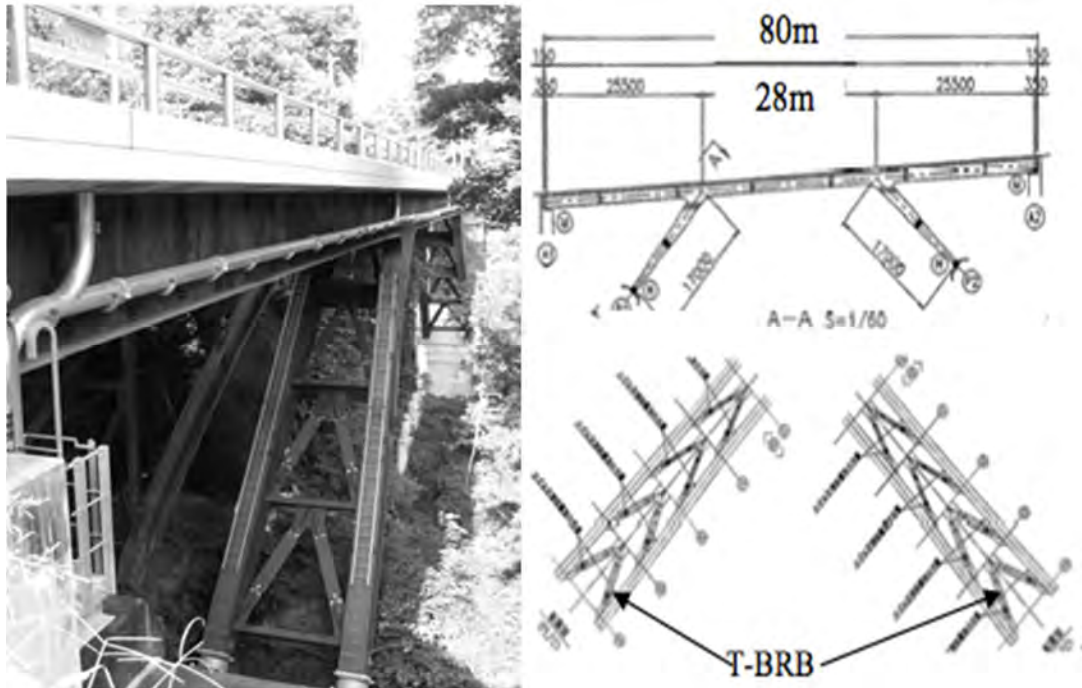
Layout of BRBs Installed in the Bridge (Oya et al., 2009)
